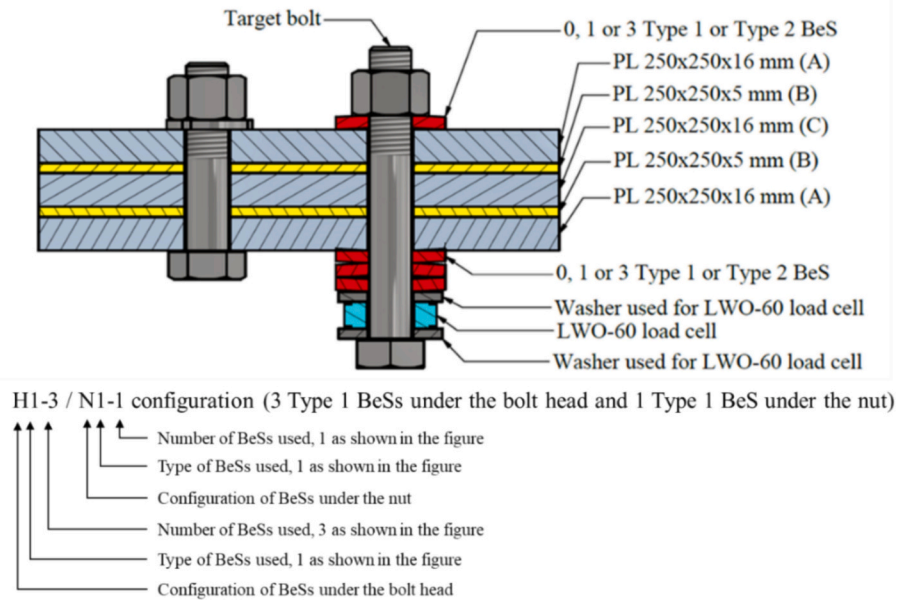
Schematic layout of the tightening test setup and the target bolt.
